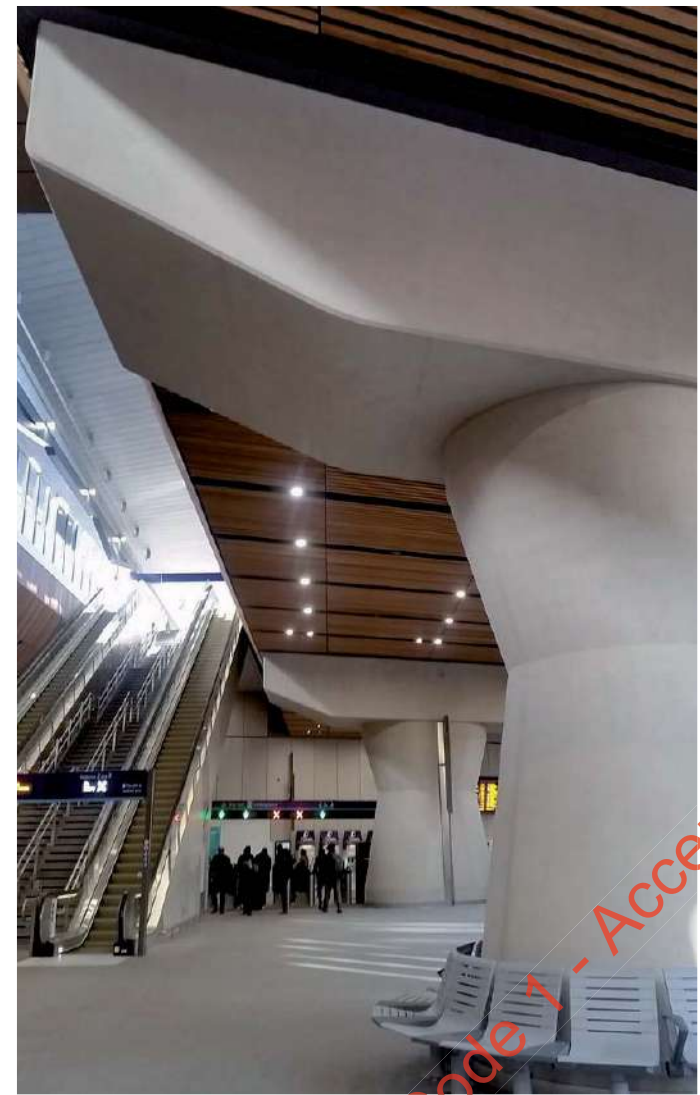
In-situ concrete viaduct columns, London Bridge Station
